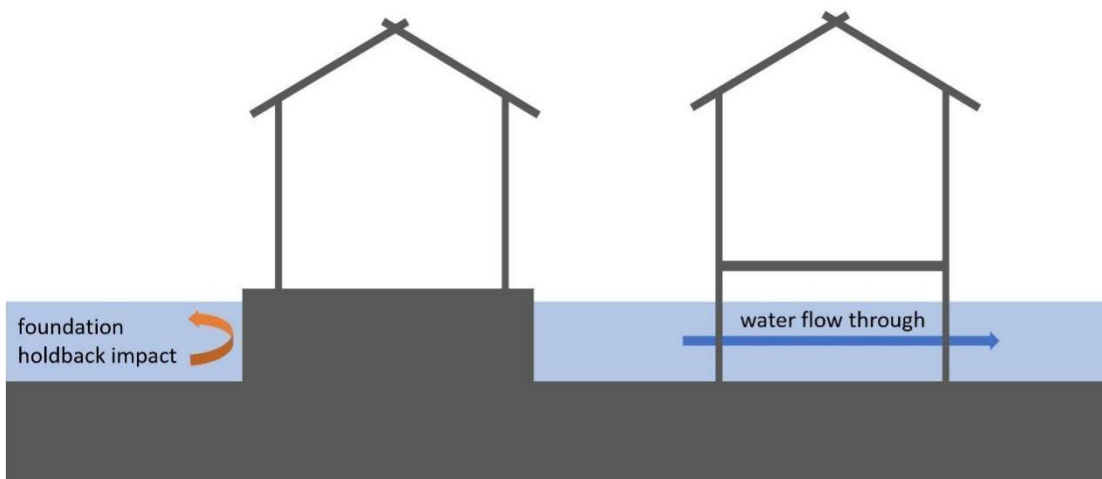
Traditional elevated house, either letting water through first floor or not resist water impact well.
